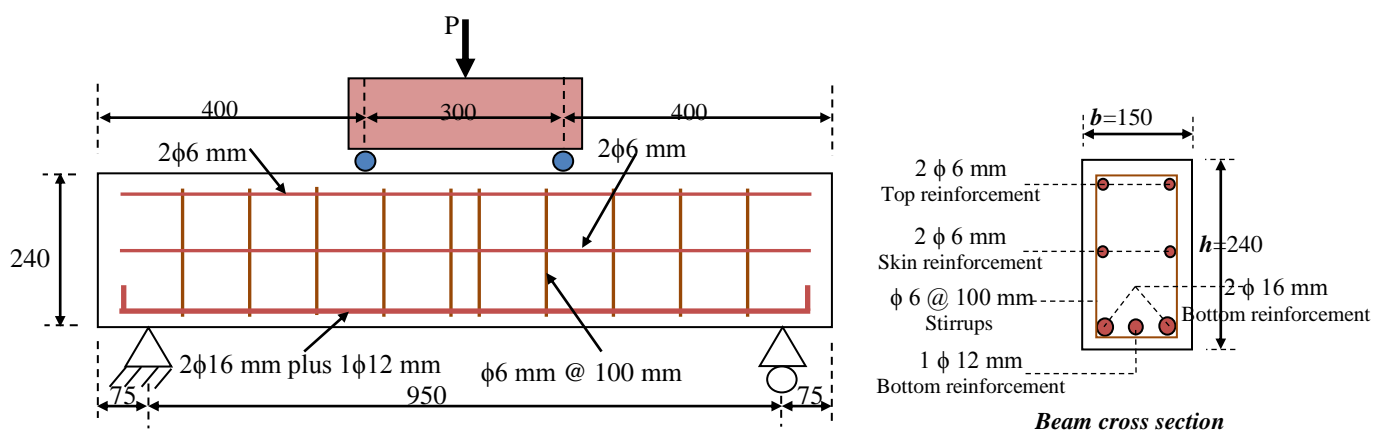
Layout of a typical tested deep beam (all dimensions are in mm).
